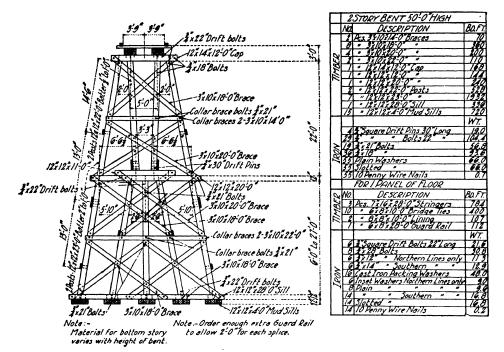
PLANS OF TIMBER FRAME TRESTLE. ILLINOIS CENTRAL RAILROAD.
